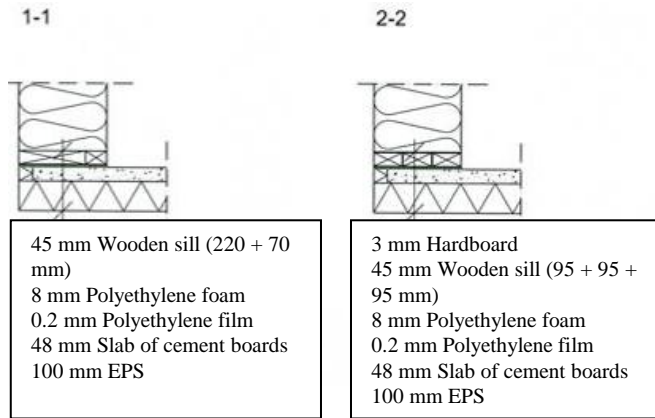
Vertical sections through Sections 1 and 2. Section 1 has no fitting sill, while Section 2 has a fitting sill in the middle.
